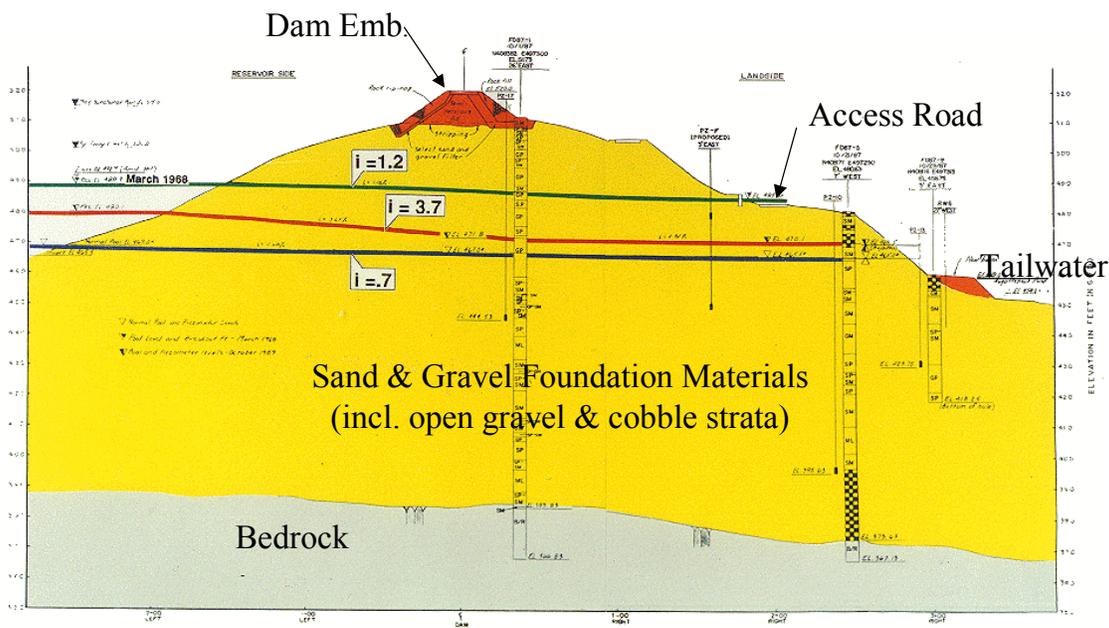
Dam embankment and foundation cross-section typical of the left abutment section
